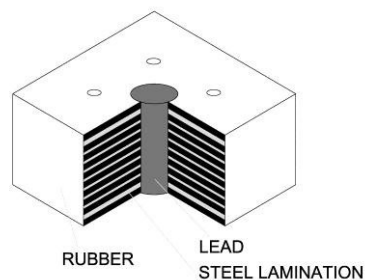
Lead rubber bearing which consist of a lead plug inserted into a vulcanized laminated rubber bearing.
